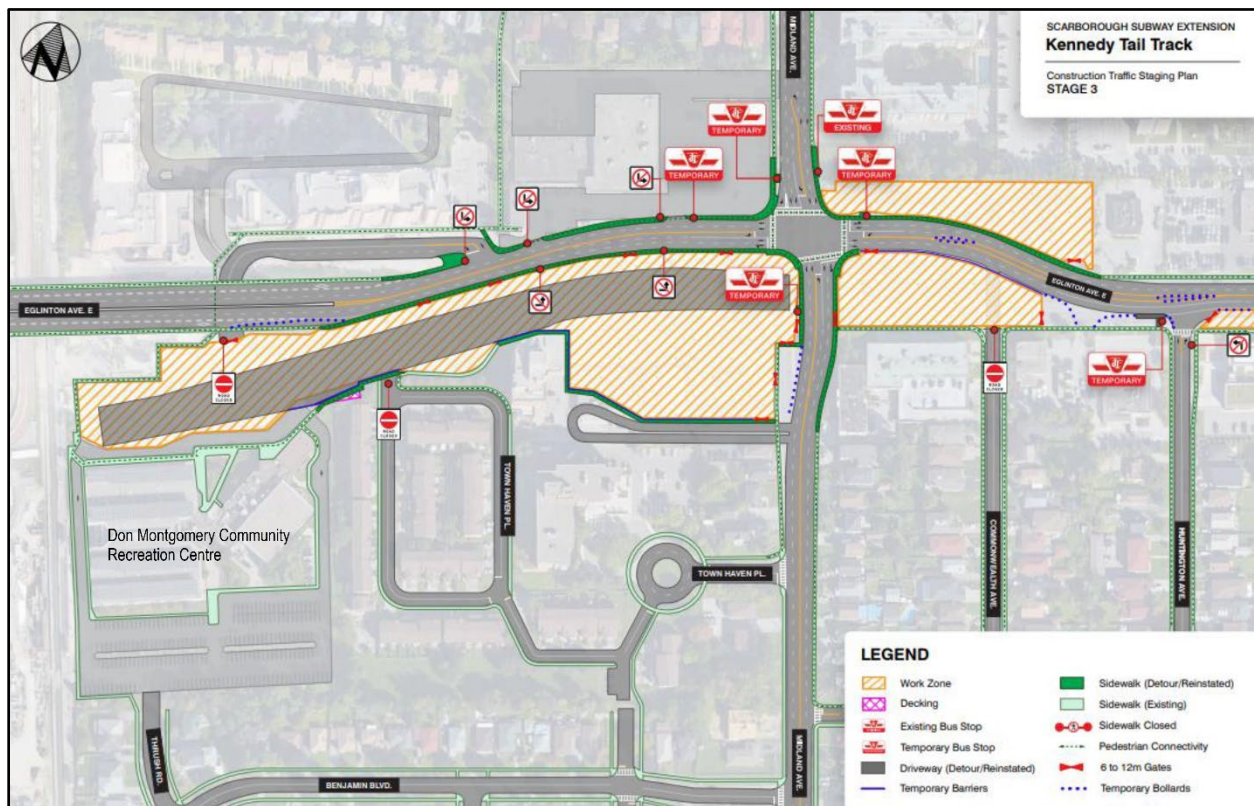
SSE-Kennedy Station Connection Construction – Stage 3
